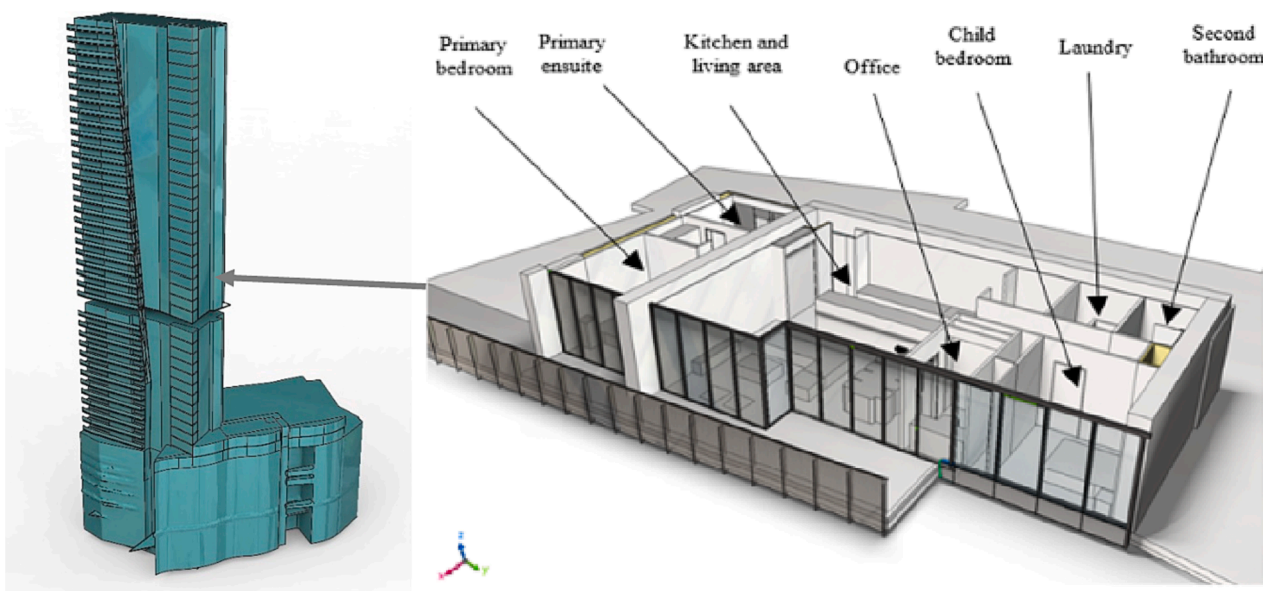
The 45-storey building with the 21st-floor apartment location (left) and the apartment’s composition (right).
